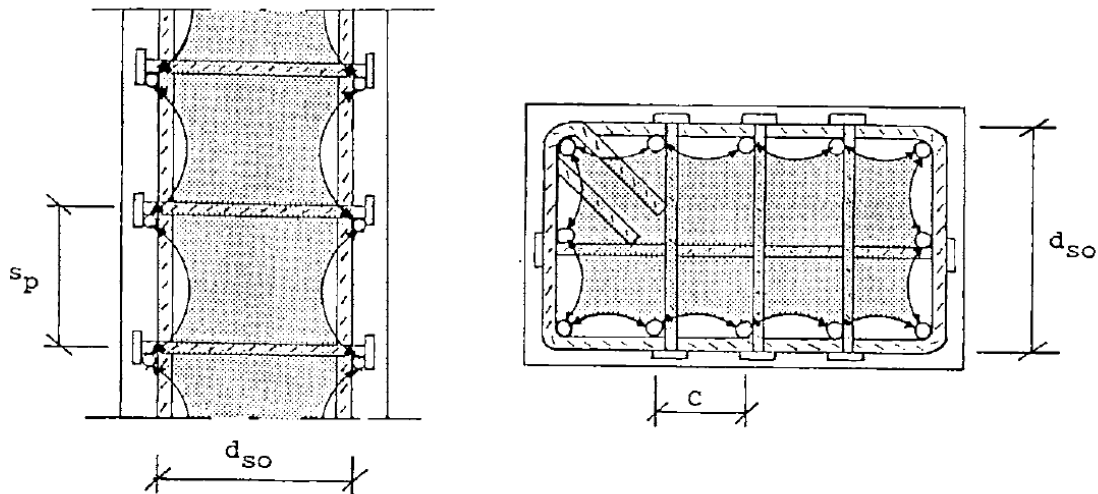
Vertical and horizontal section with compressive arches between reinforcement (Bjerkeli et al. 1990)
